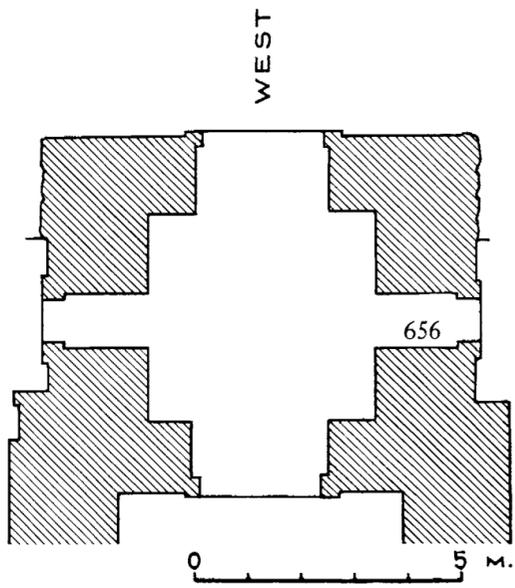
SECOND-FLOOR PLAN, CENTRAL TOWER
